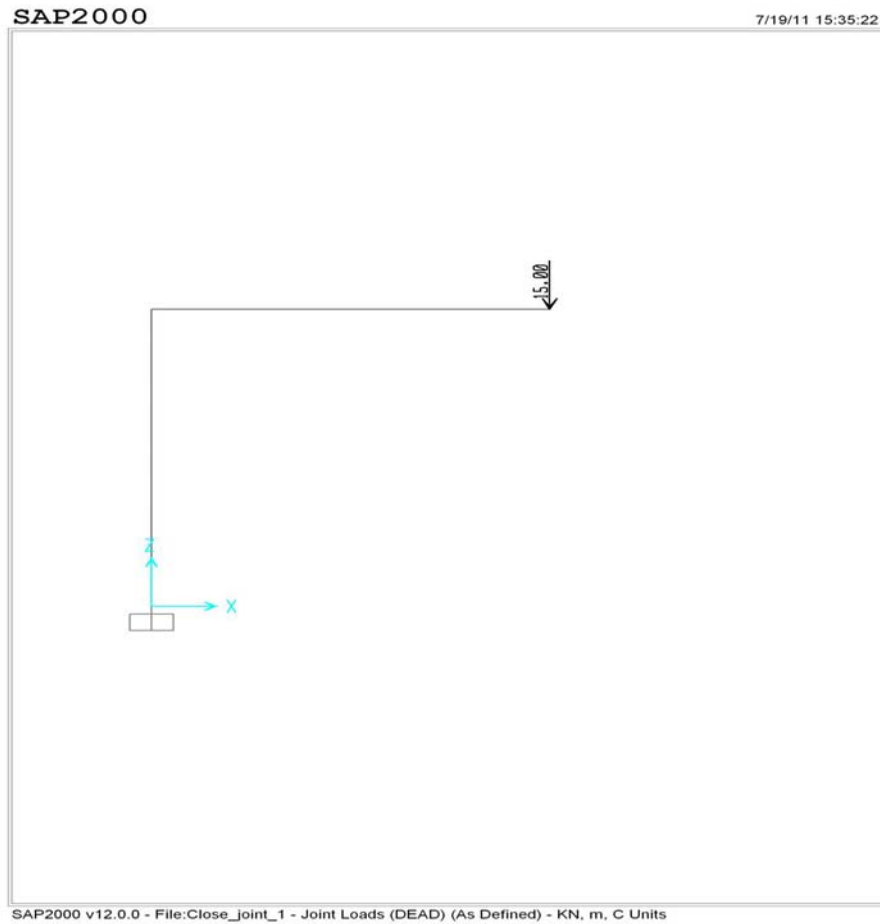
Beam column joint –for specimen-A as per Sap(Closed joints)
